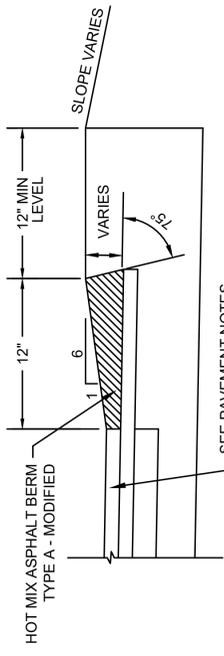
DETAIL FOR PAVEMENT TRANSITION AT LIMIT OF WORK
